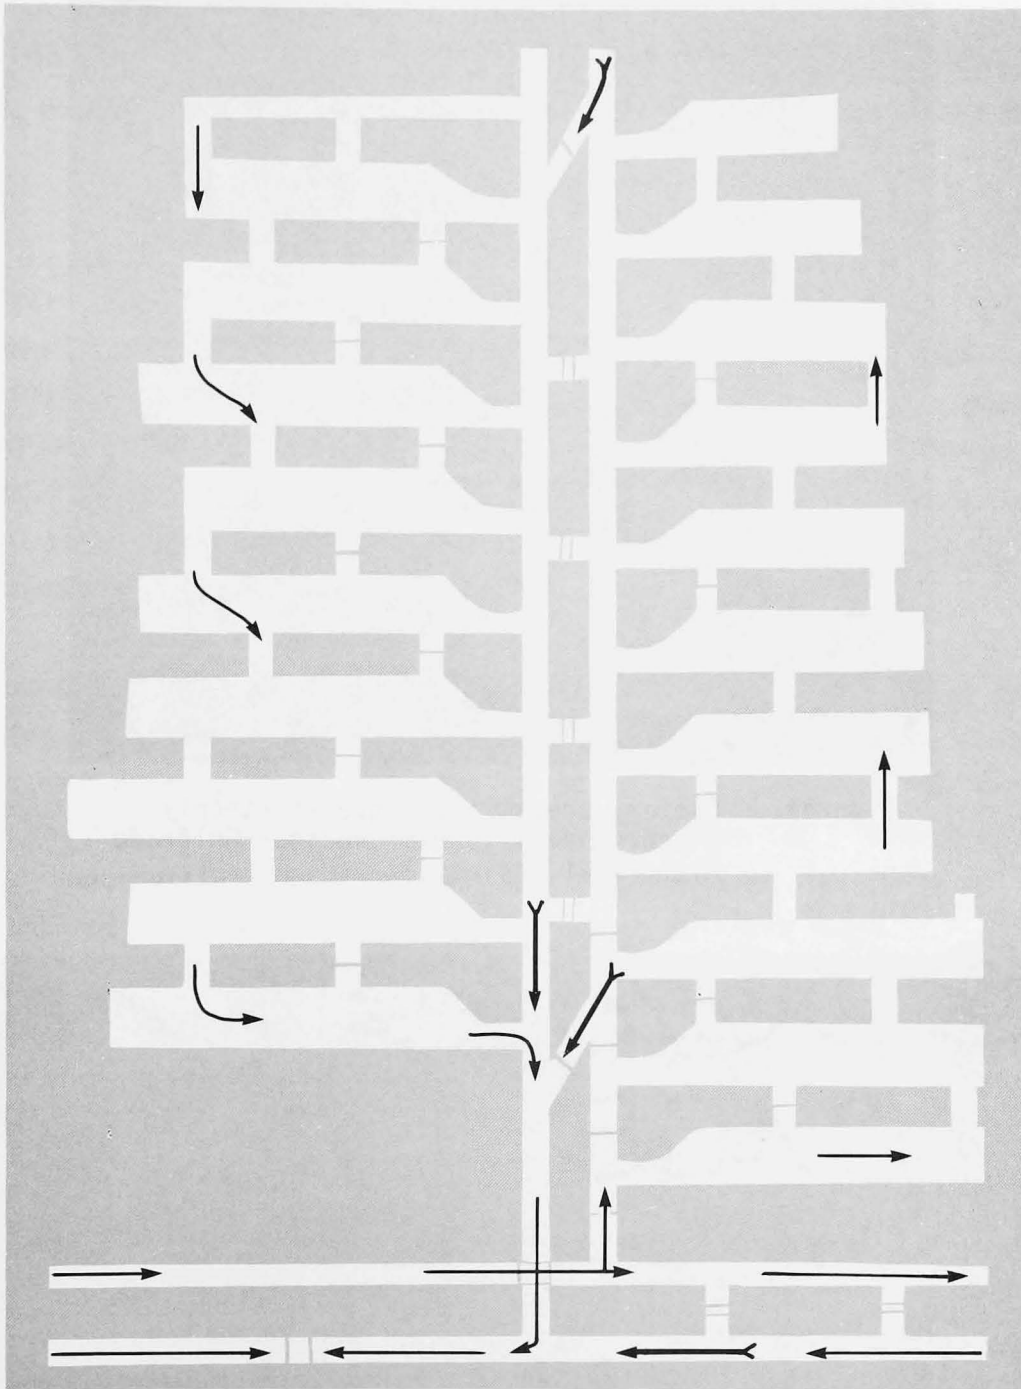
Typical room-and-pillar mine layout; arrows indicate ventilation scheme.
